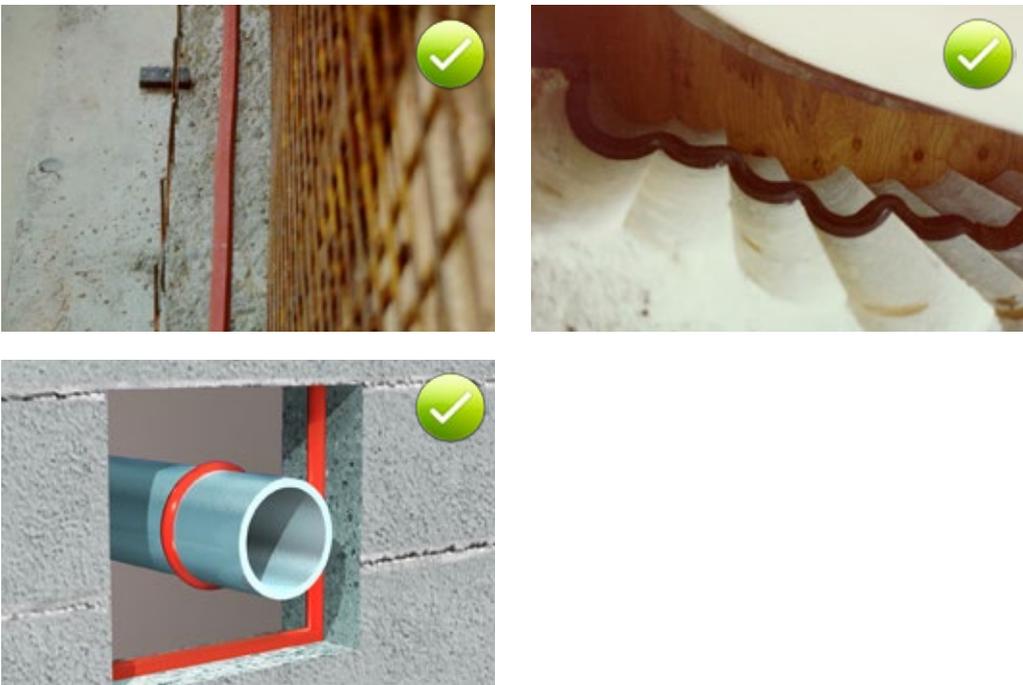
Waterproofing with a swellable profile of: (a) a construction joint, (b) a connection joint with bored pile walls, (c) a pipe penetration
